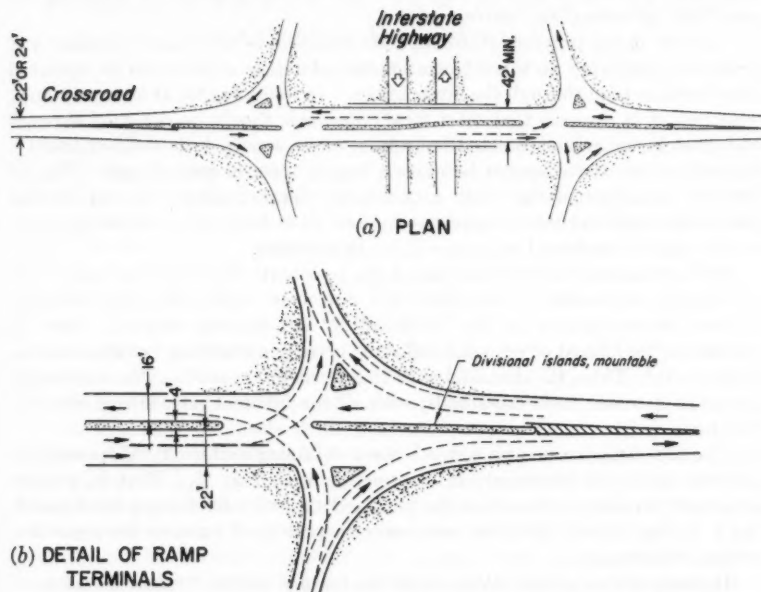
ADAPTABILITY OF DIAMOND INTERCHANGE TO MINOR RURAL CROSSROADS WITH DIVISIONAL ISLAND
